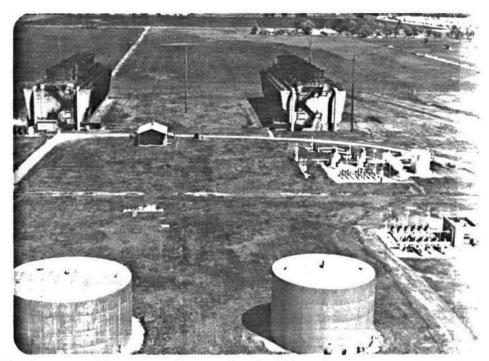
View from the boiler house roof facing north showing oil storage tanks, natural gas meter and regulator stations, and cooling towers.
